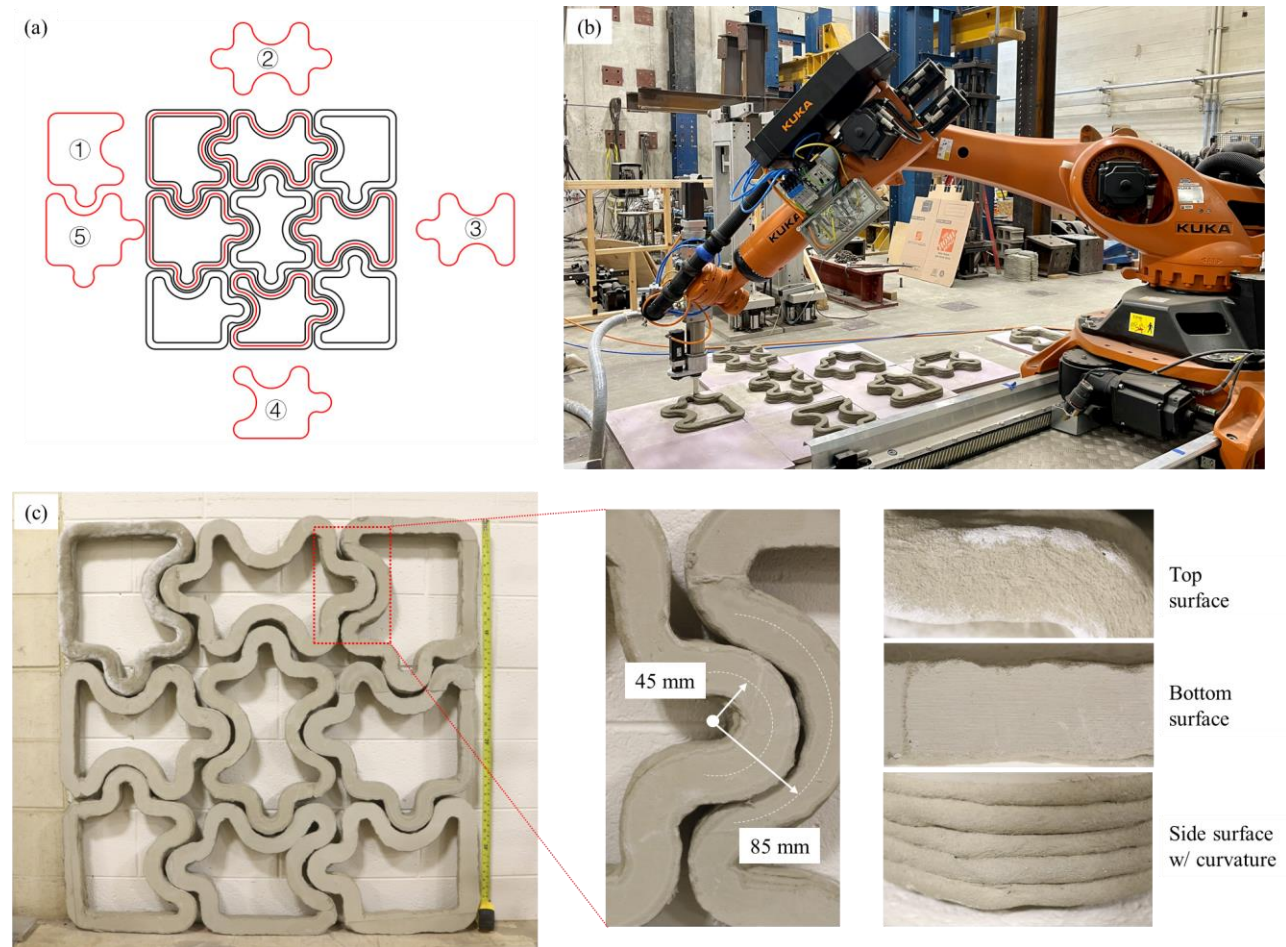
(a) Puzzle-inspired printing pattern design; (b) printed pieces; (c) self-interlocked ECC pieces and close-up looks
